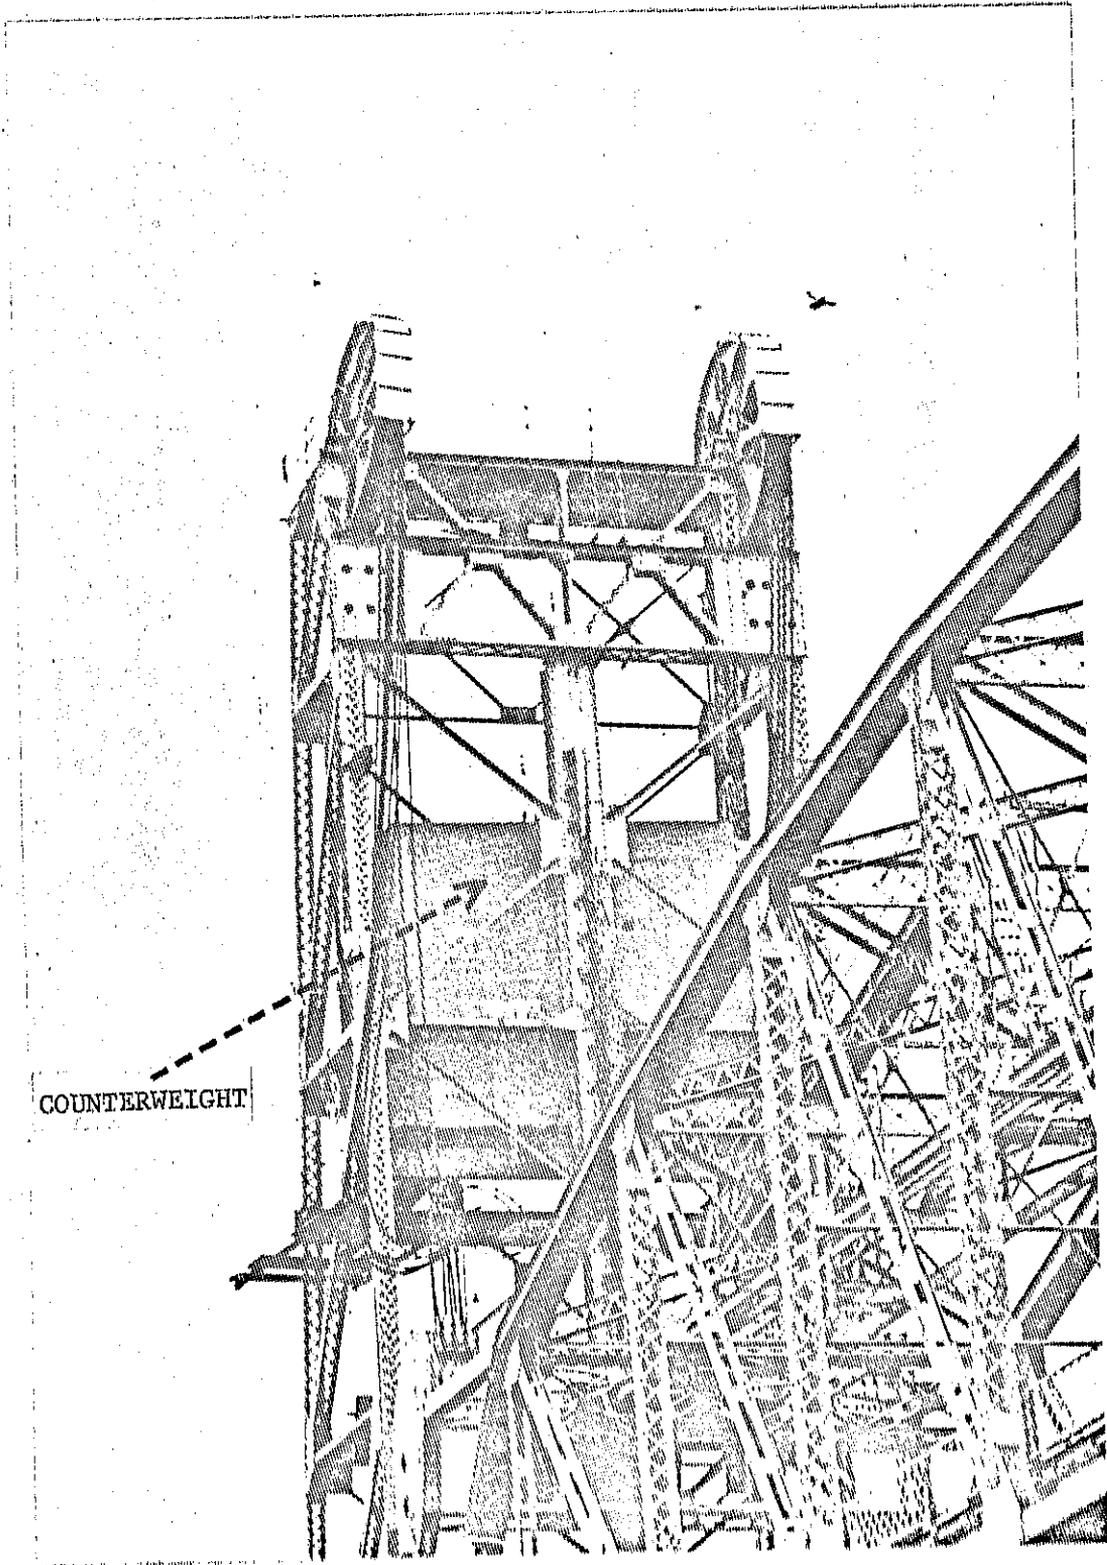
North supporting tower for lift span on Shippingsport Bridge.
